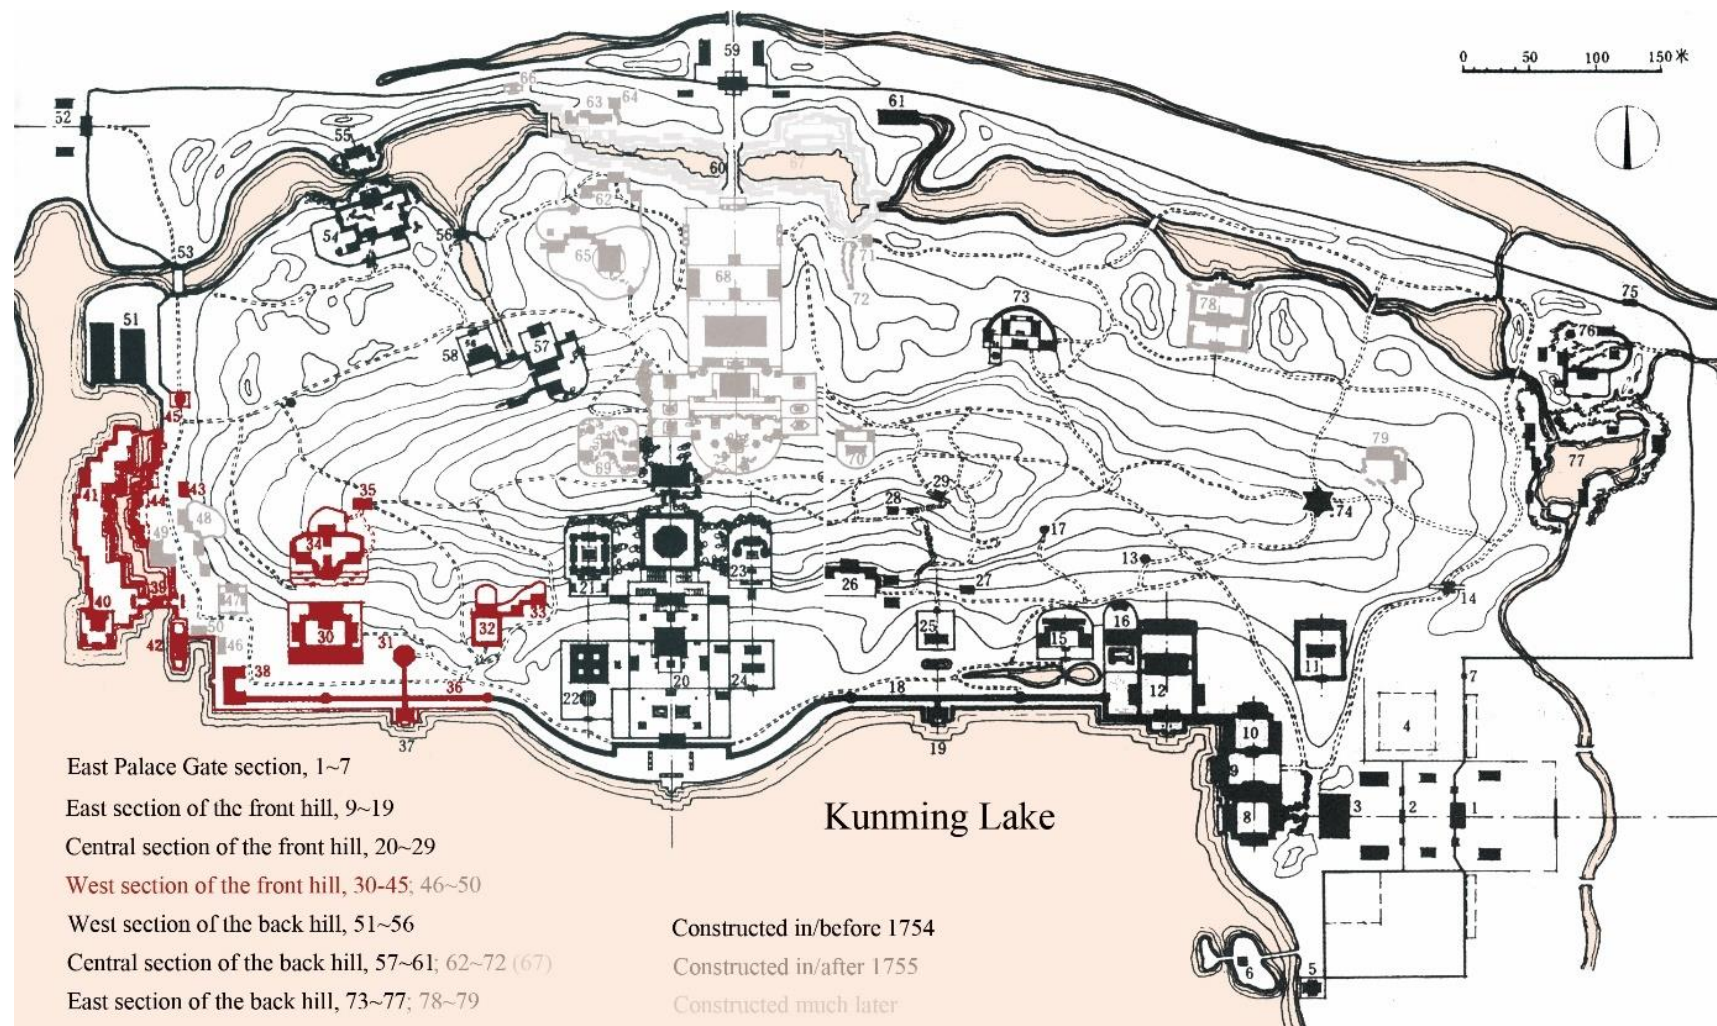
The plan drawing of the Qingyi Garden.
